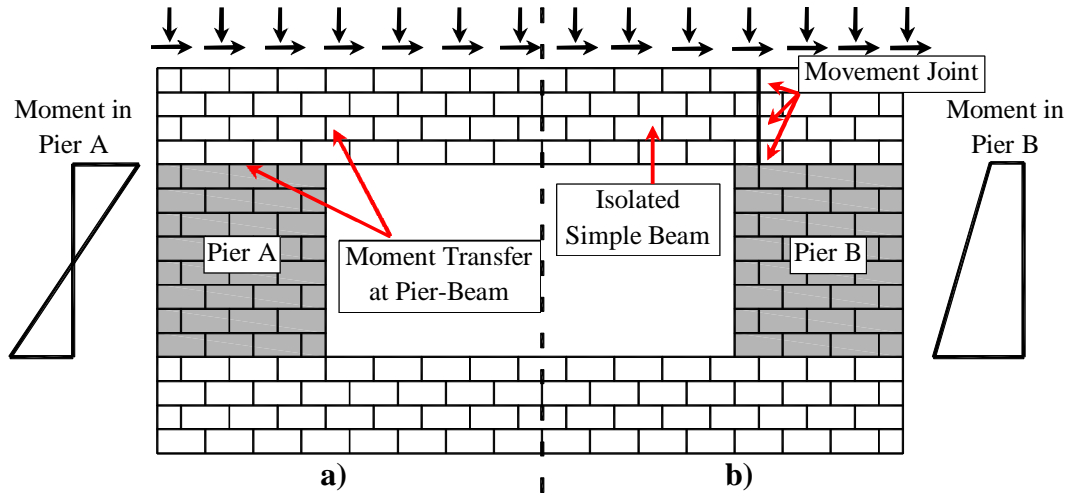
Masonry Piers as They Appear in Structural walls in: a) Masonry Frames; and b) Masonry Structural wall with Isolated Openings
